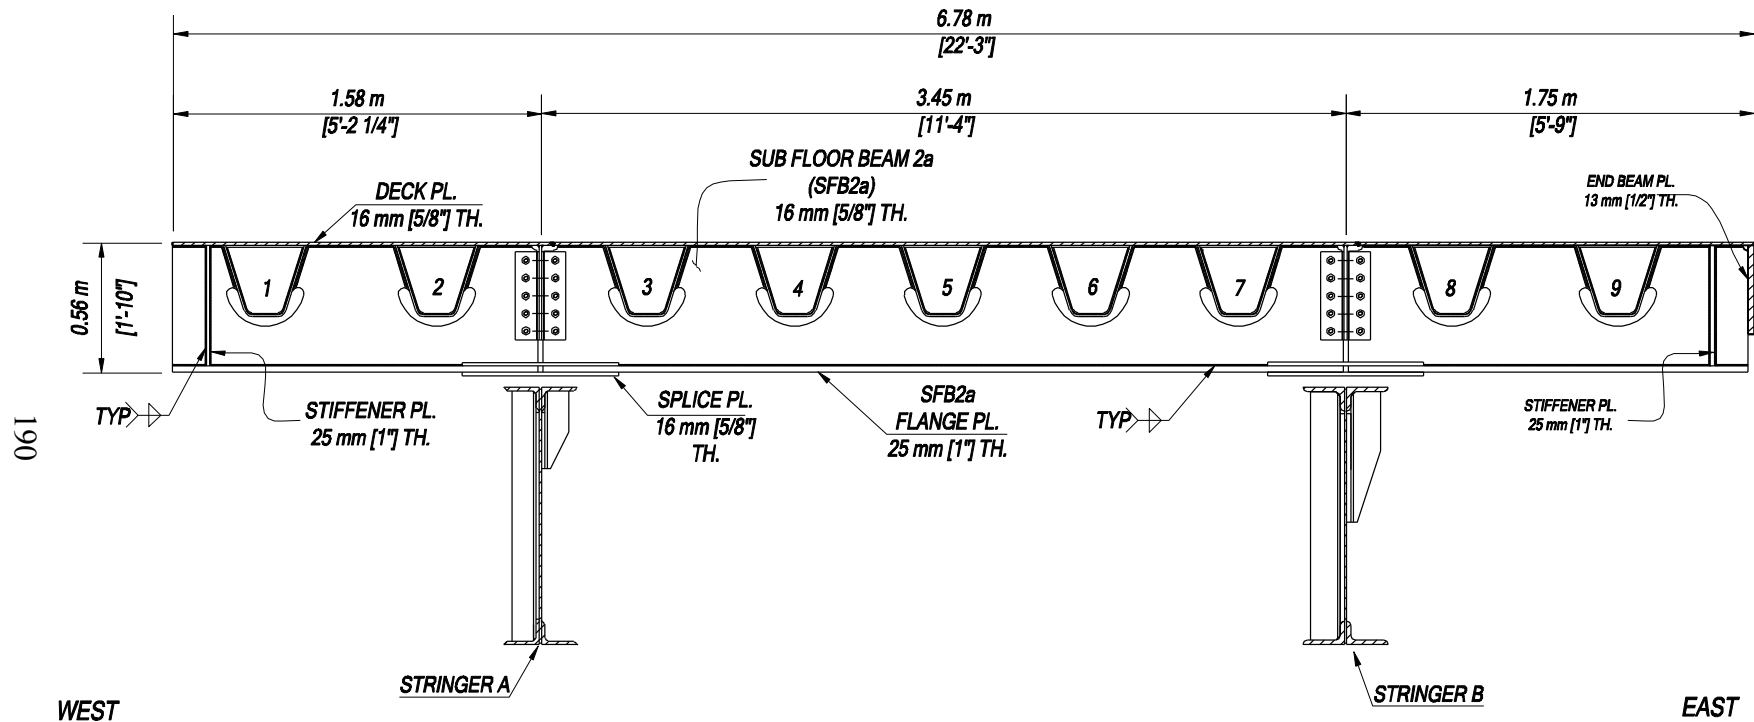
A typical section of the Phase 1 deck at intermediate subfloor beam (prepared by R. S. Deo Alapati)
